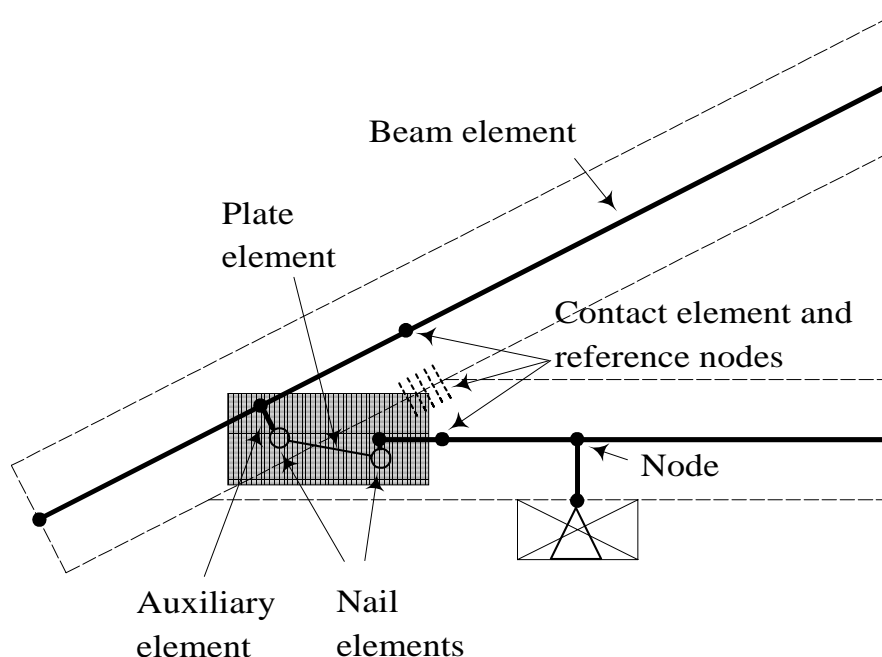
Heel joint used to explain the use of elements in TRUSSLAB.
